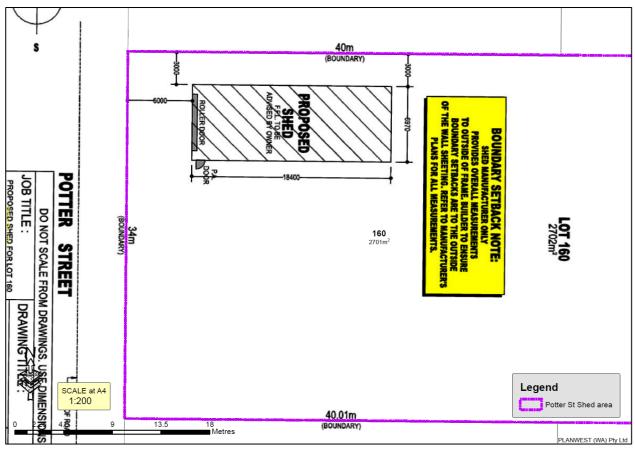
EXTRACT OF DA PLAN OF PROPOSED BUILDING
